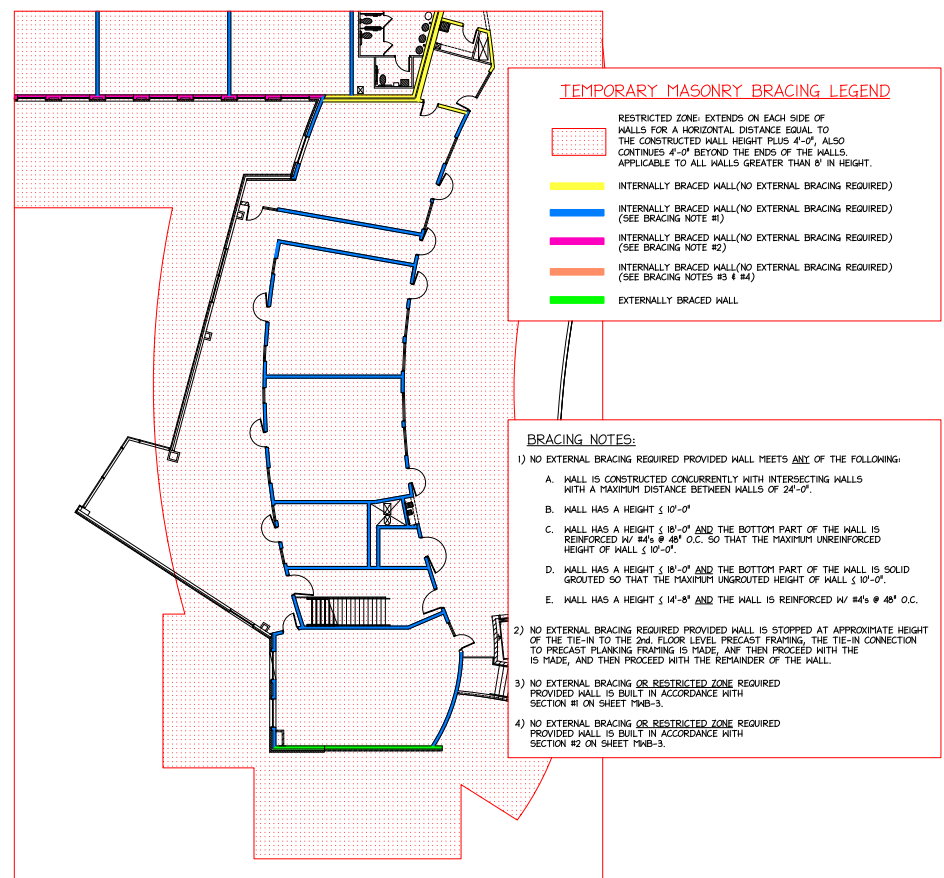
Bracing plan content. Courtesy of IMI – Internal Bracing Guide.
